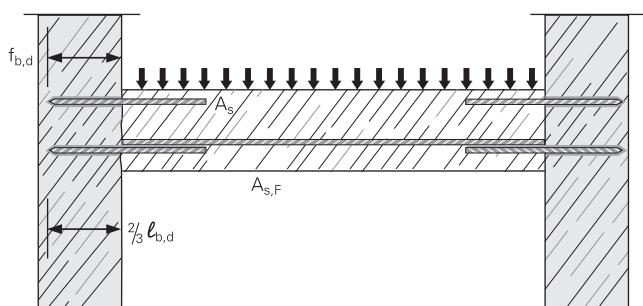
End anchoring of slabs or beams design as simply supported.
